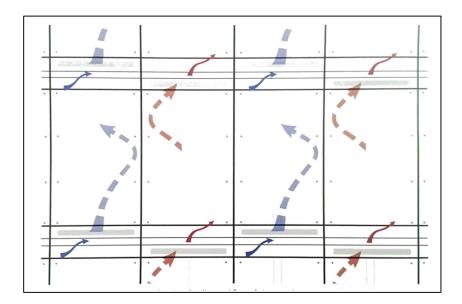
RWE Headquarters Tower – arrangements of intake and outtake louvers (courtesy of Ingenhoven Architects)
